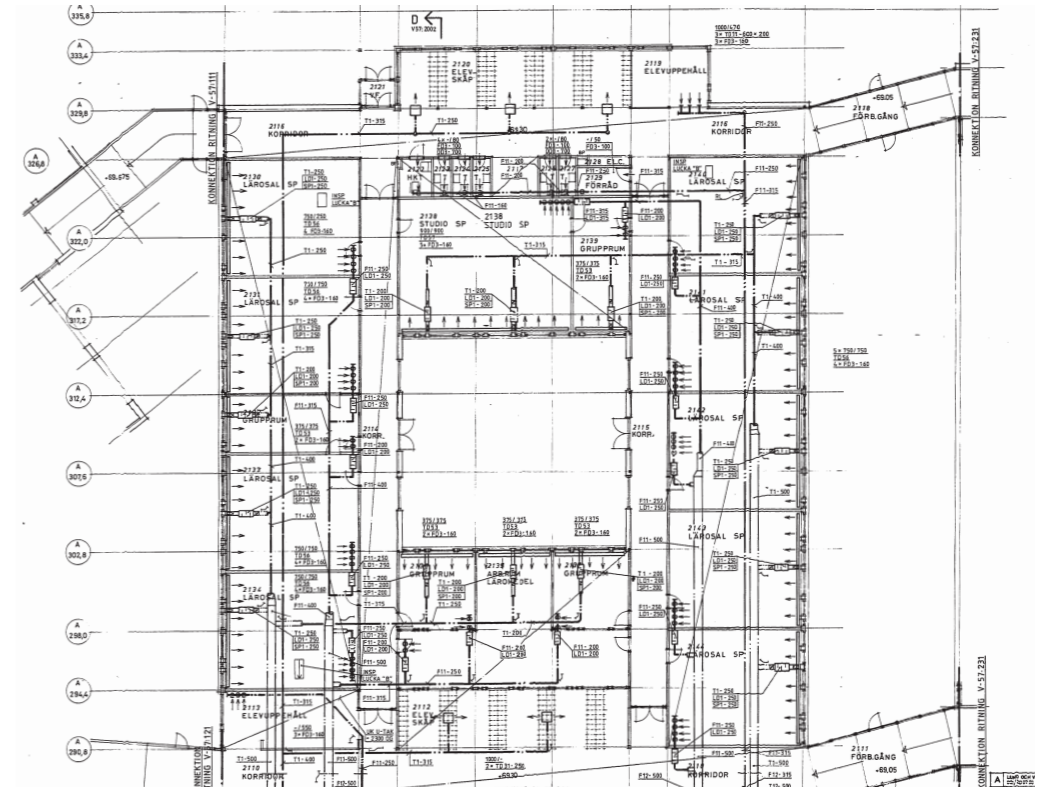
Archive Plan of Building 21, Lund And Valentin Arkitekter 1981
